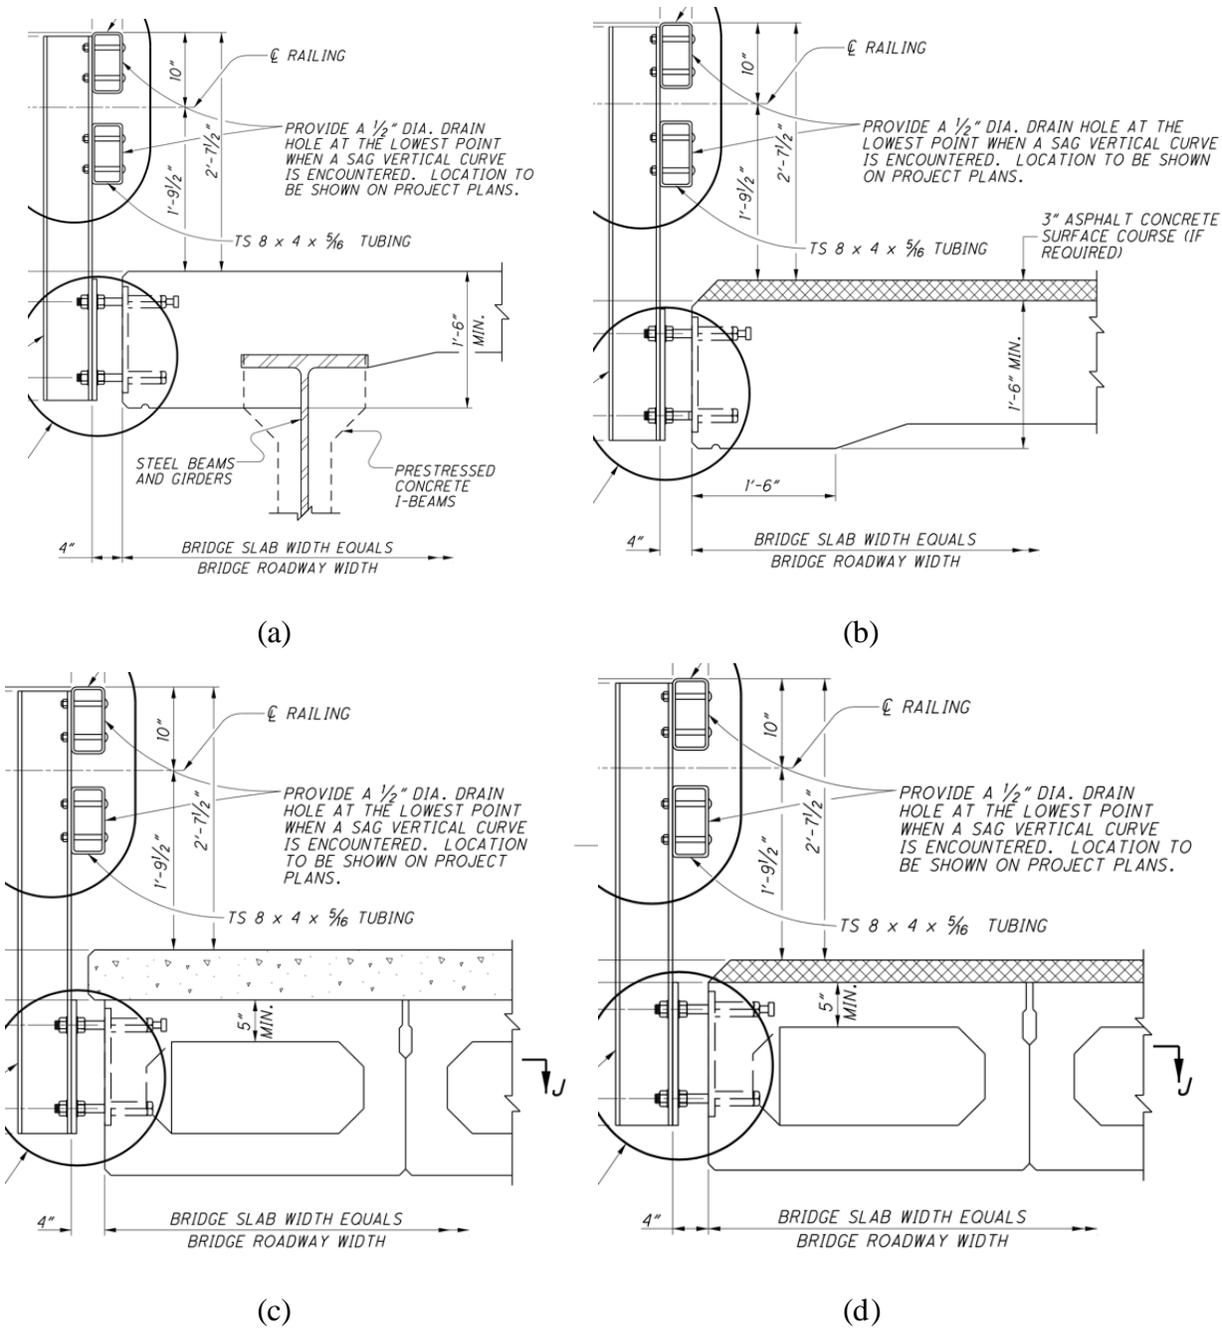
ODOT (a) Bridge Slab, (b) Bridge Slab with Asphalt Wearing Surface, (c) Box Girder with Concrete Wearing Surface, and (d) Box Girder with Asphalt Wearing Surface [1]
